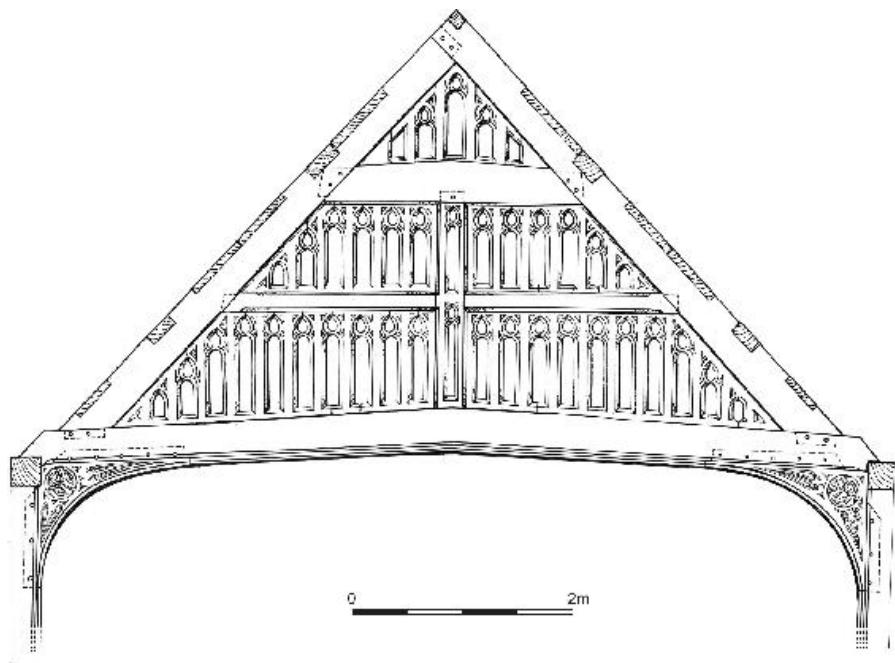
A tie-beam truss in the roof of the Booth Hall.
